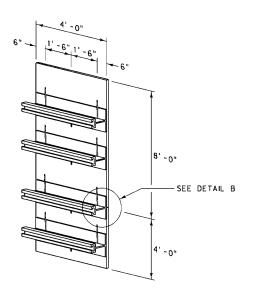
DETAILED DRAWING REFERENCE STANDARD SPEC. SECTION 619, 704
